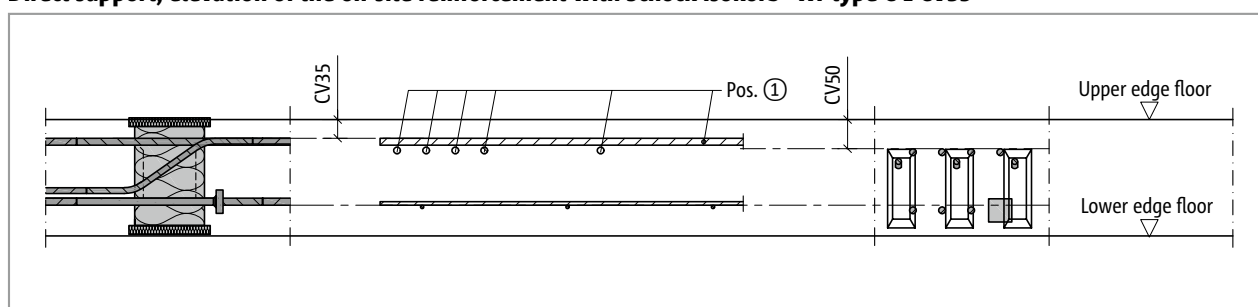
Schöck Isokorb® XT type C: On-site reinforcement outer corner balcony (section XT type C-L-CV35, view XT type C-R-CV50)
